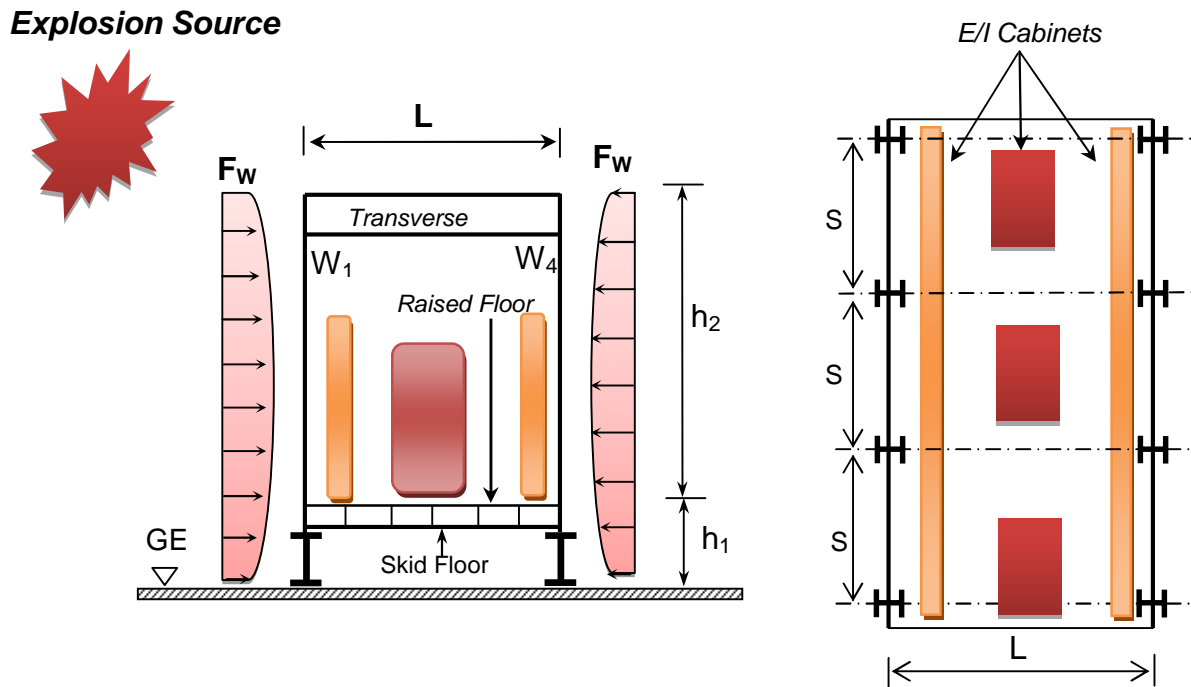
BLAST RESISTANT BUILDING STRUCTURAL LAYOUT
